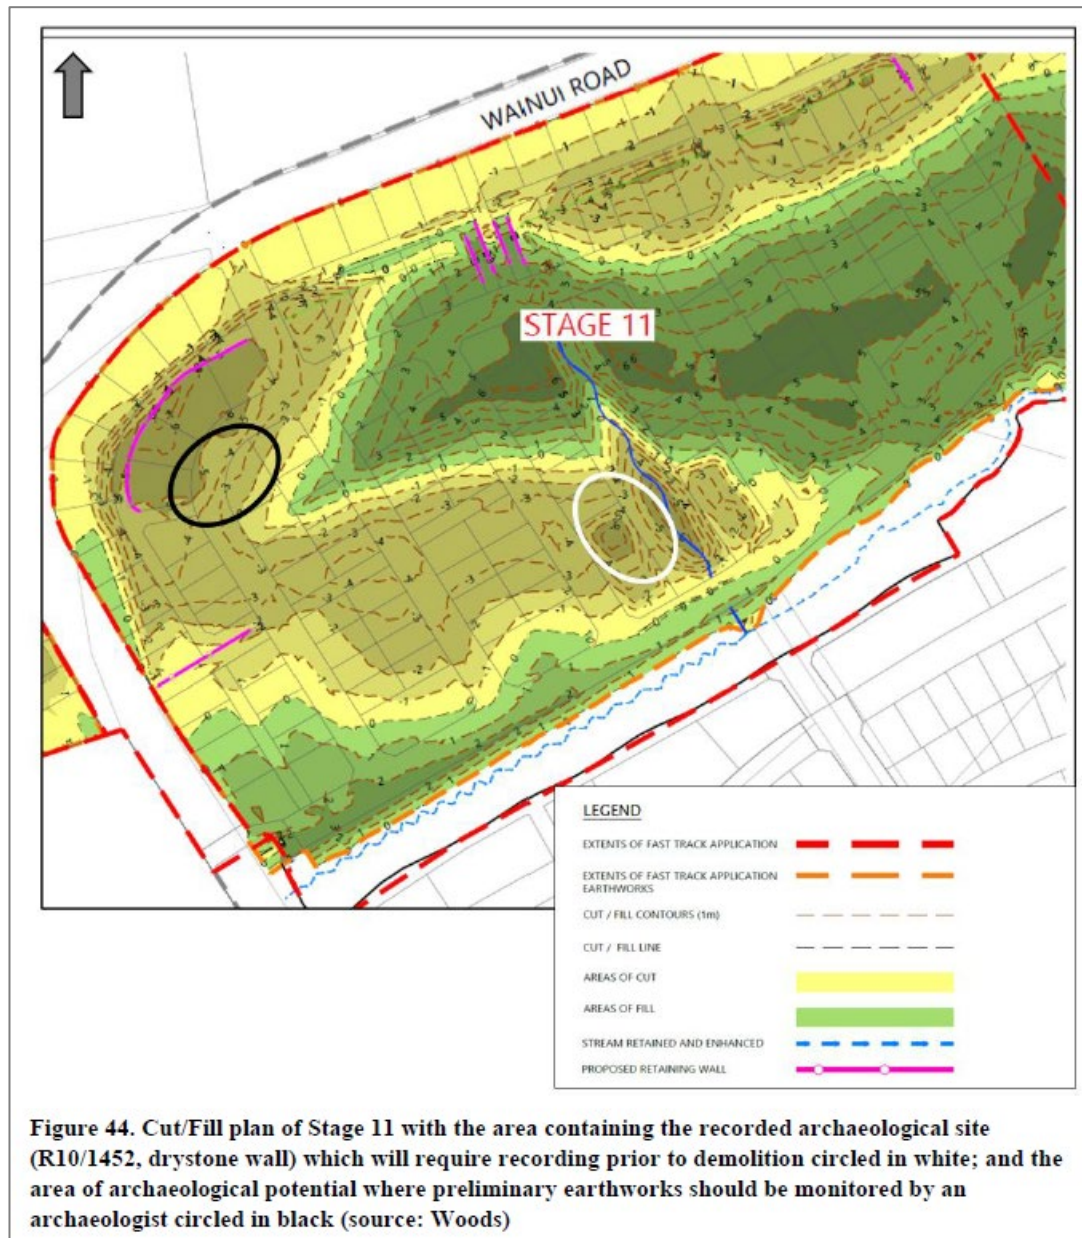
Stage 11 earthworks cut/fill plan detailing the extent of archaeological monitoring during the earthworks phase for the recorded site (white) and the potential site (black). Source: Appendix 5C.
